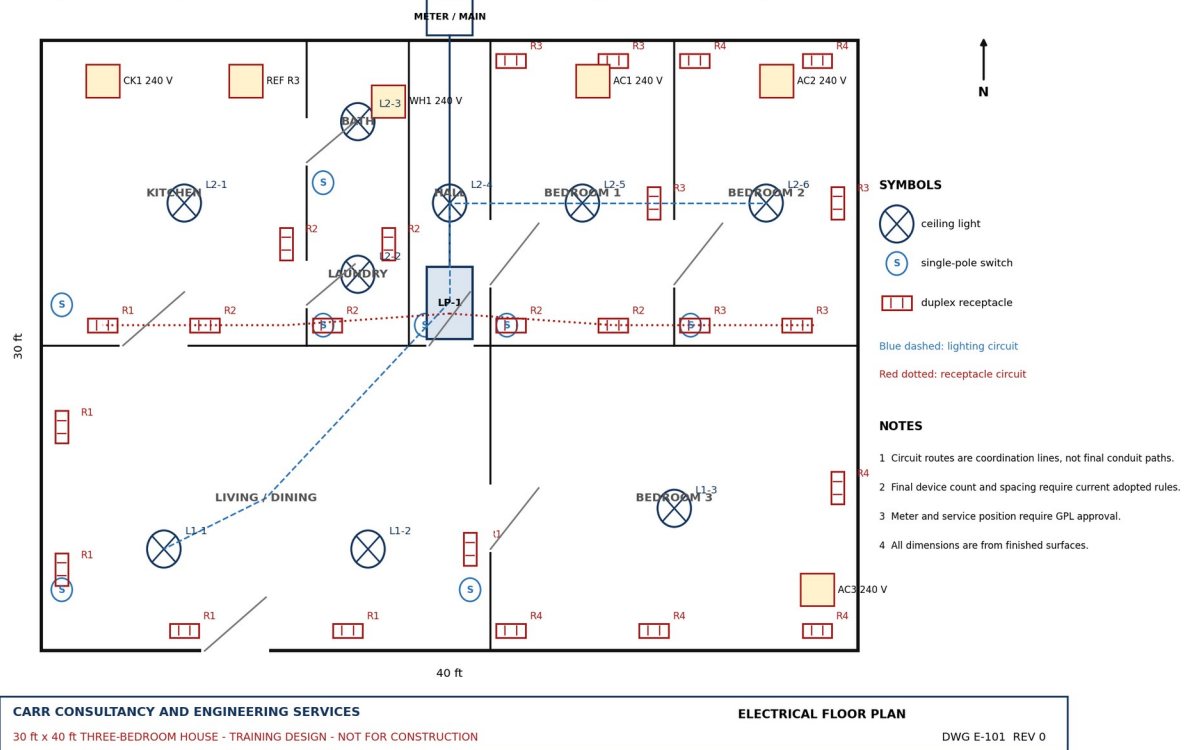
Original CARR diagram for house drawings outlets switches lights panel and meter placement.
